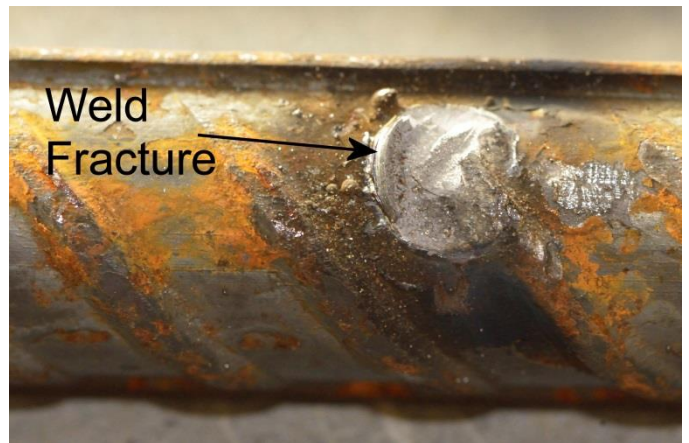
Fractured Tack Weld, Exemplar 2
